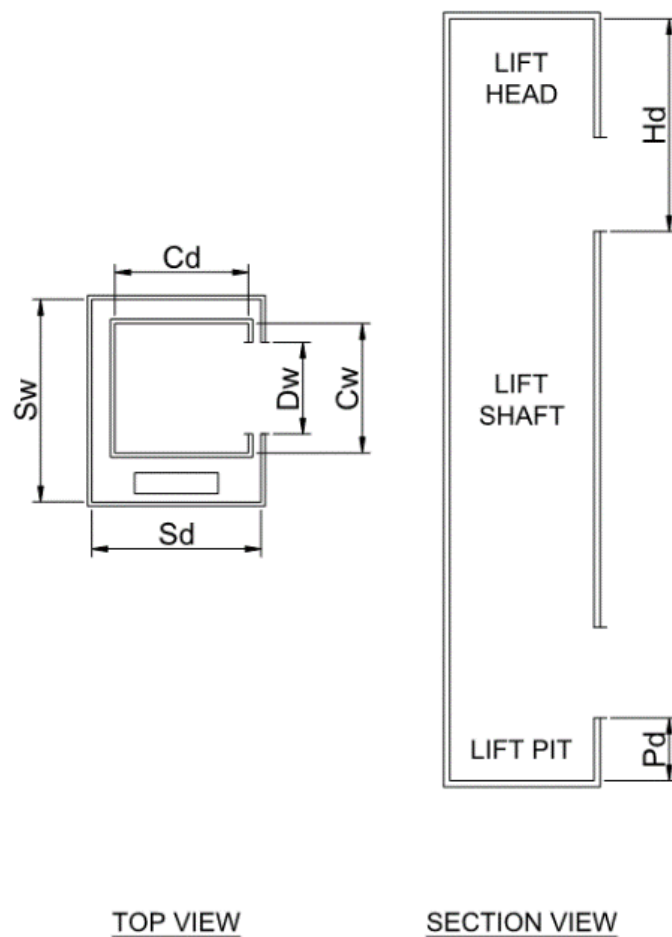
GENERAL LIFT SHAFT PLAN & SECTION
